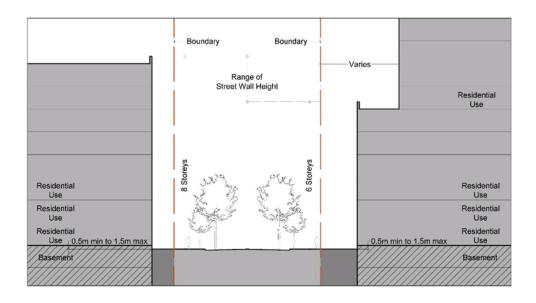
Podium / Street Wall Height with Setback, NTS
